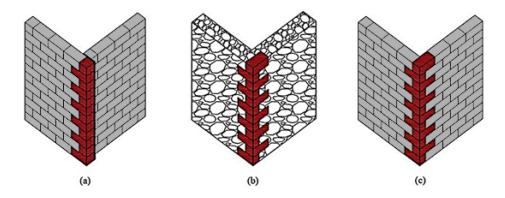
Corner details (a) lack of keystone, (b) insufficient bracing, (c) adequate bonding [8]
